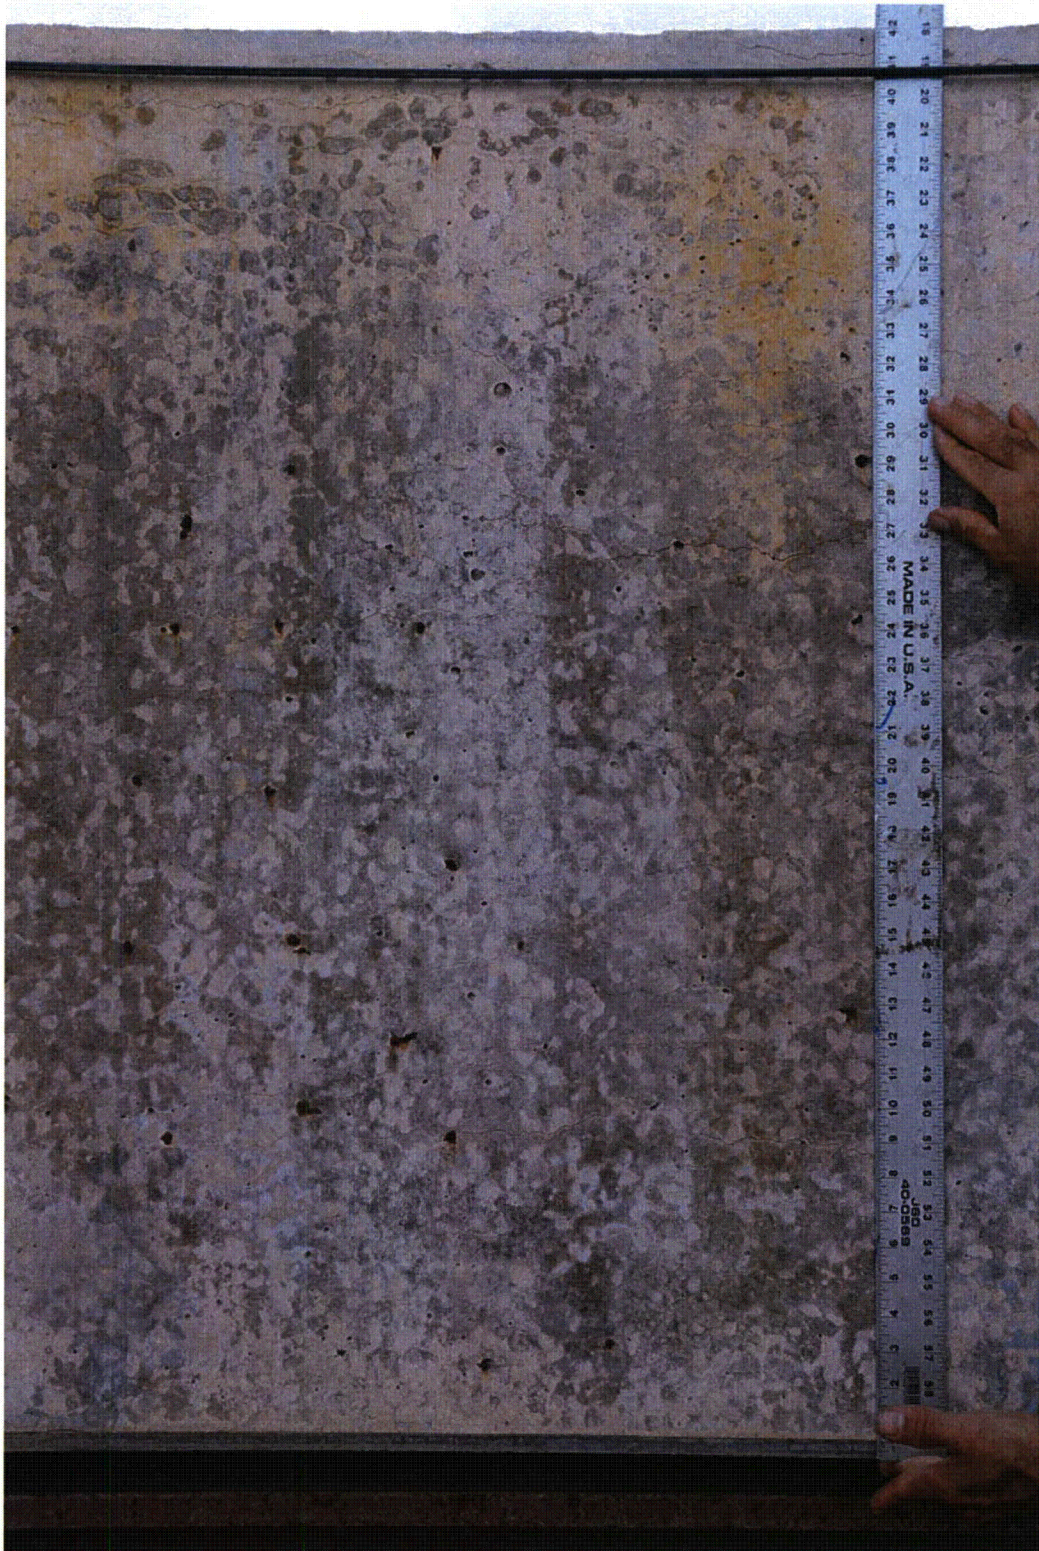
Midsection of ASR-Affected Beam (Confined Face)
